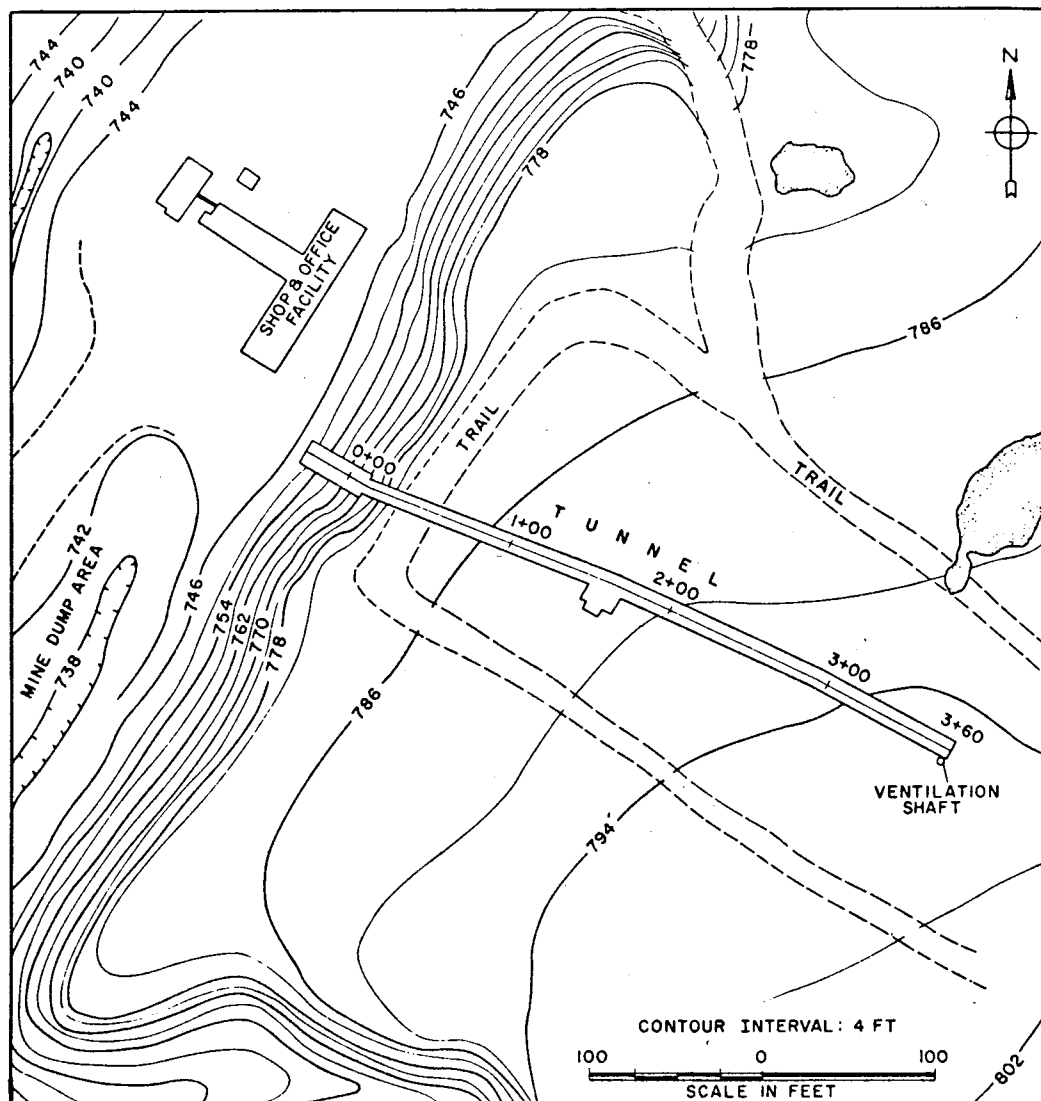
SITE PLAN OF FOX TUNNEL SITE,
